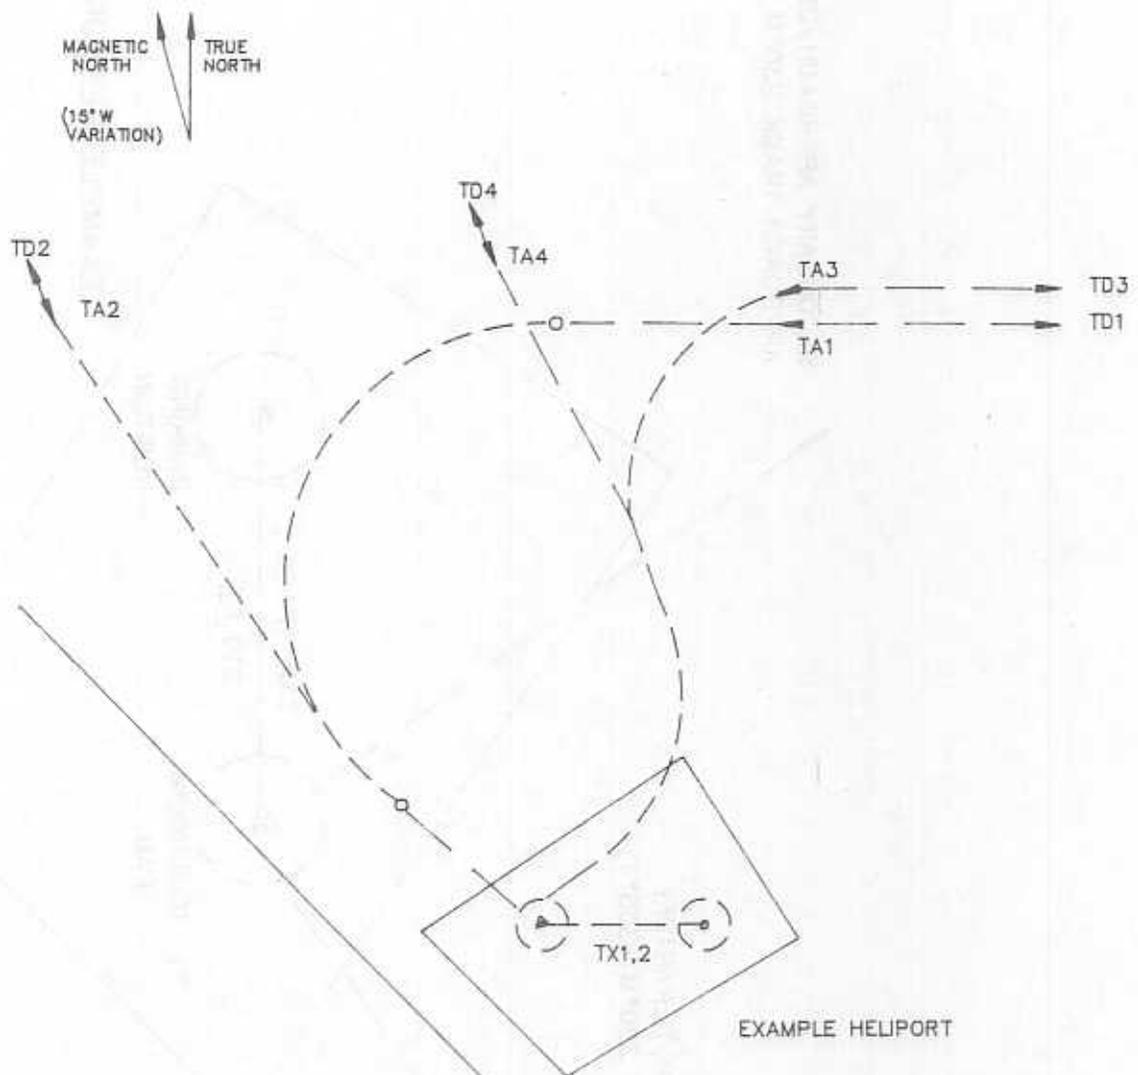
EXAMPLE HELIPORT LAYOUT
